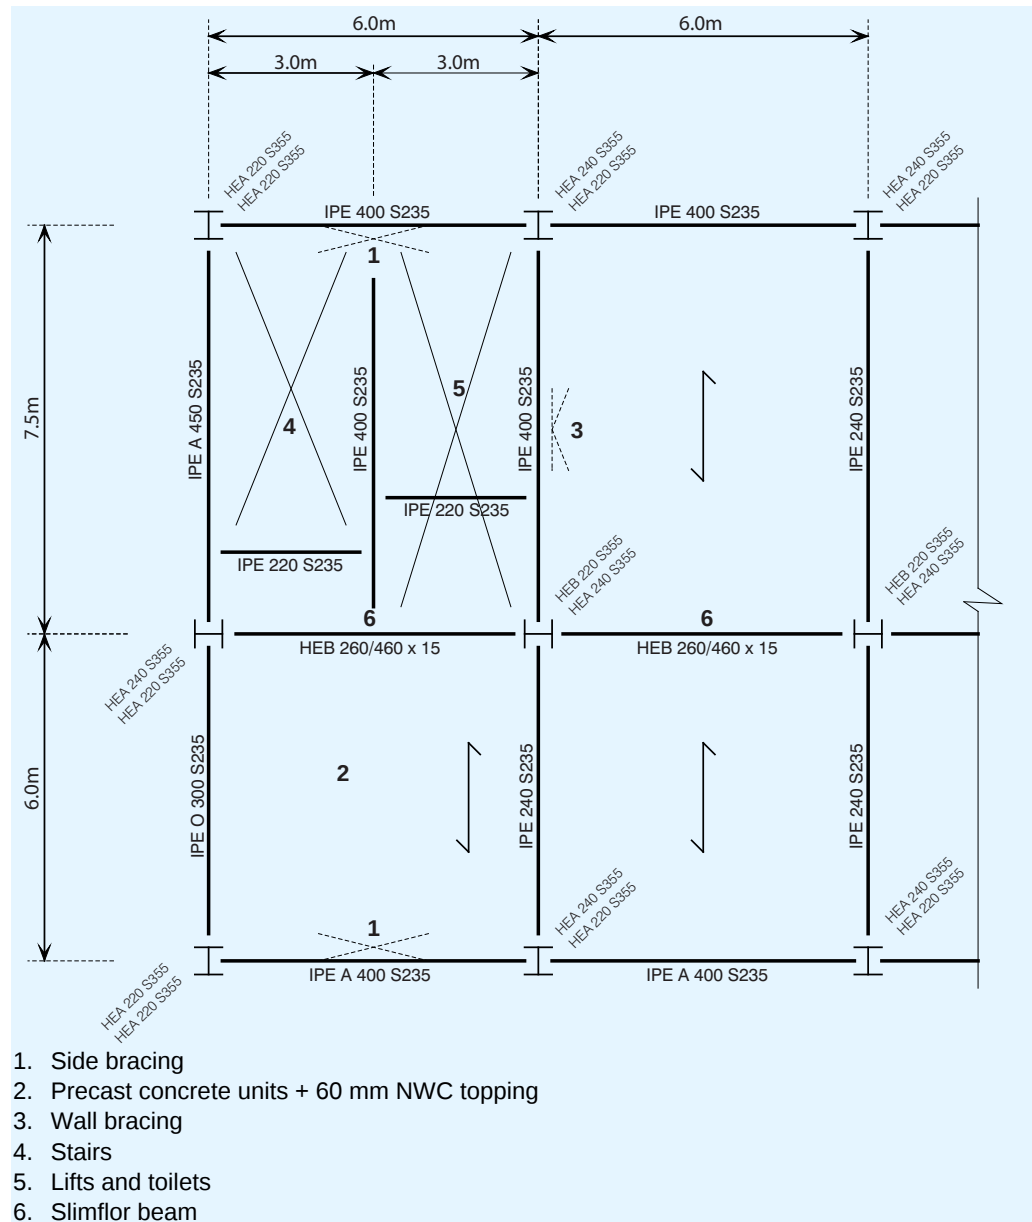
Slim floor steelwork arrangement for a four-storey rectangular building (central spine slim floor beam and downstand edge beams)
